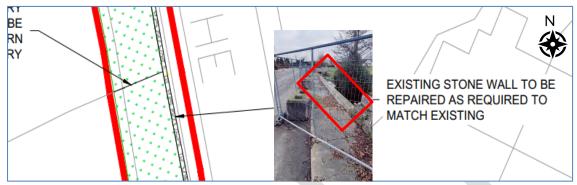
Existing Stone Wall and Footpath provision and Proposed Works
